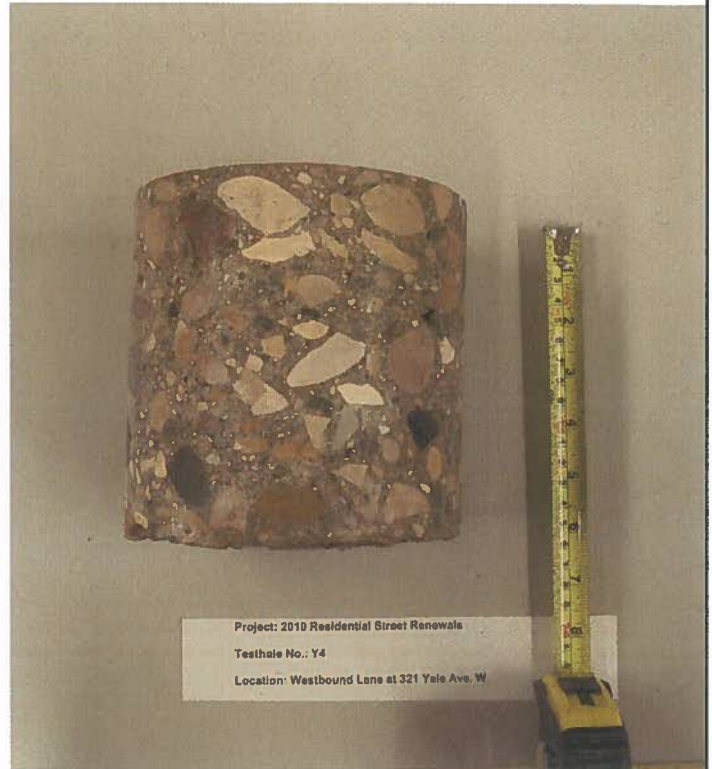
Test Hole Y4: 321 Yale Ave. W., Westbound Lane, 115 m W of W sidewalk at Winona St., 1.9m S of N curb
